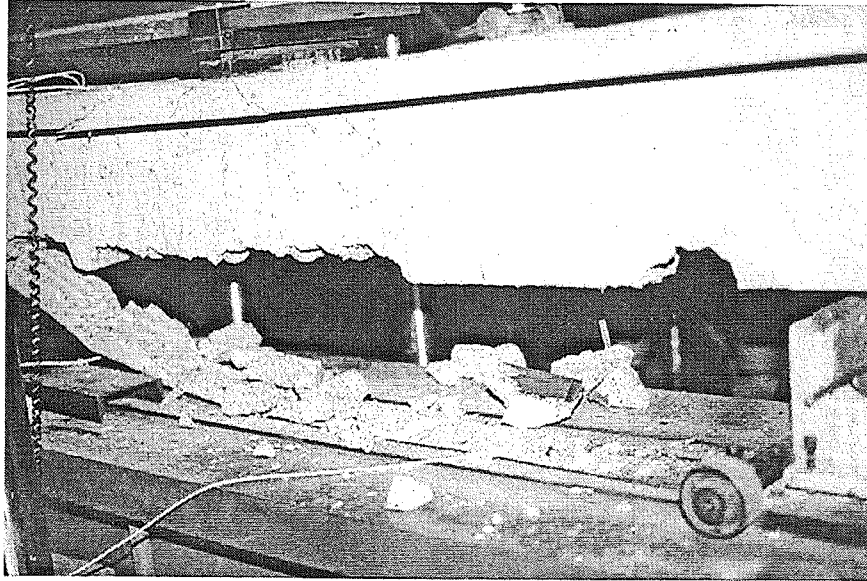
Interfacial shear failure of concrete in Beam No. 14.
